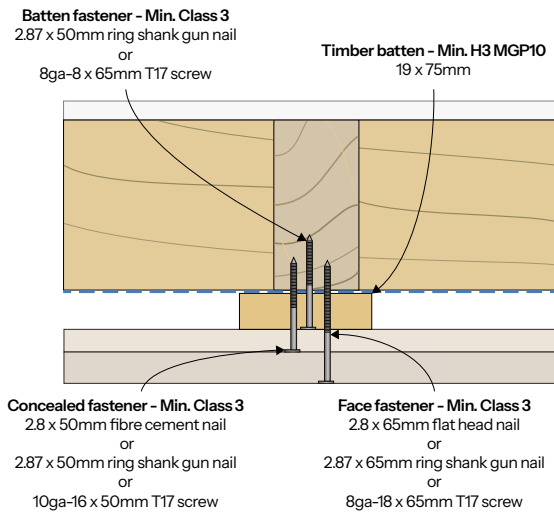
Timber frame - cavity fix (19mm) fastener detail Plan
